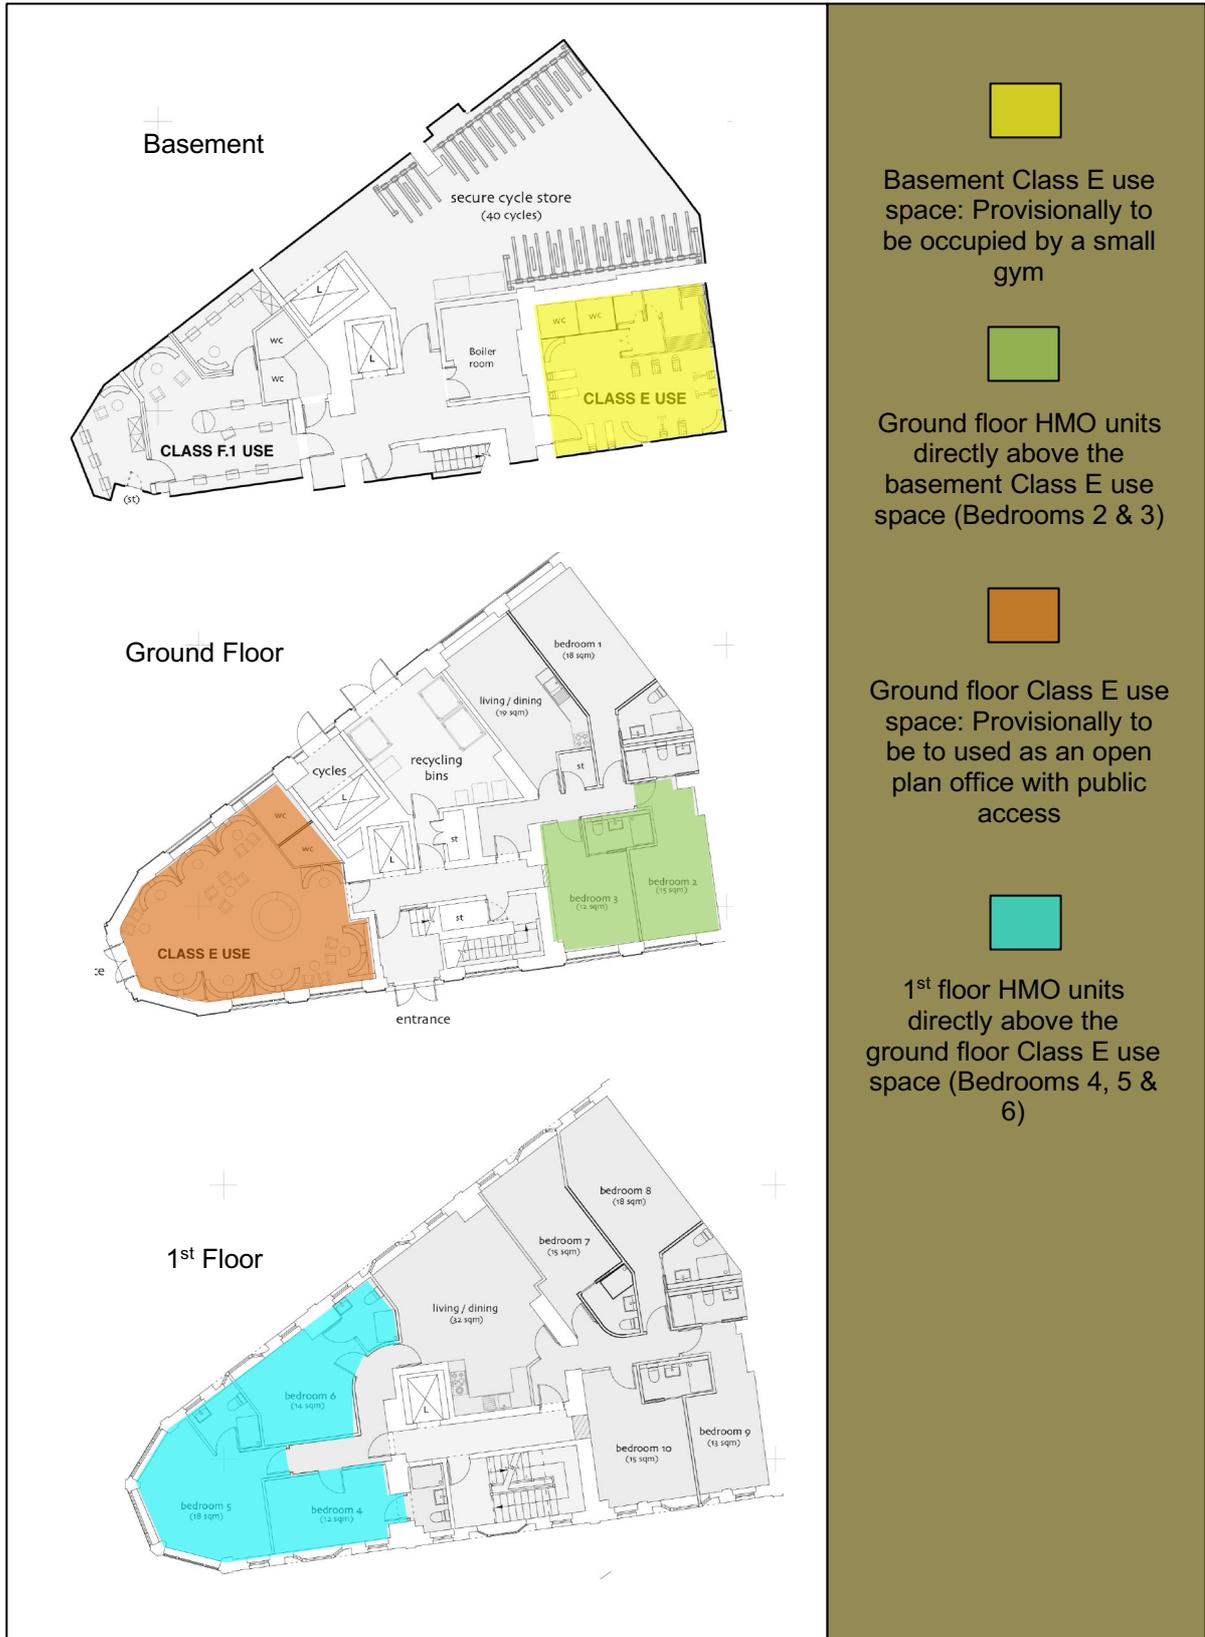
Basement, ground and 1st floor plans with Class E use spaces and HMO units directly above identified
